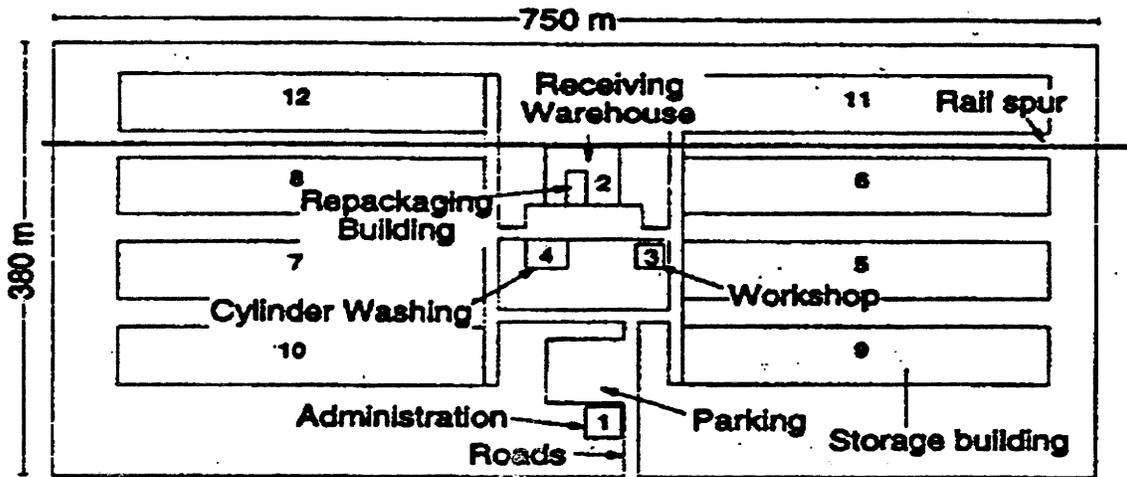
Site Layout UF₆ Building Storage Facility - 100% Capacity
